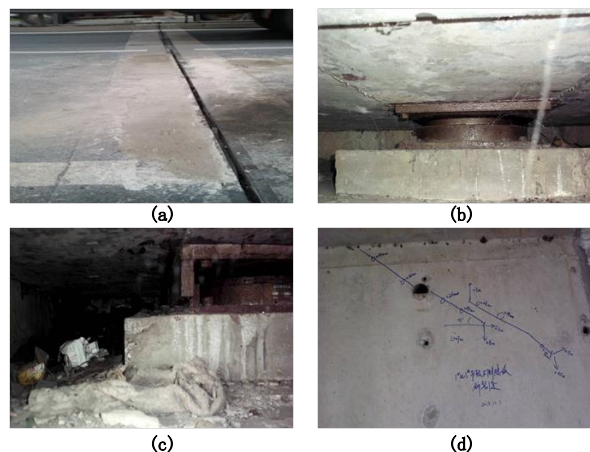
Bridge inspection results (a) blocked expansion joint (b) steel plate corrosion (c) local edge failure (d) cracks on the box girder
